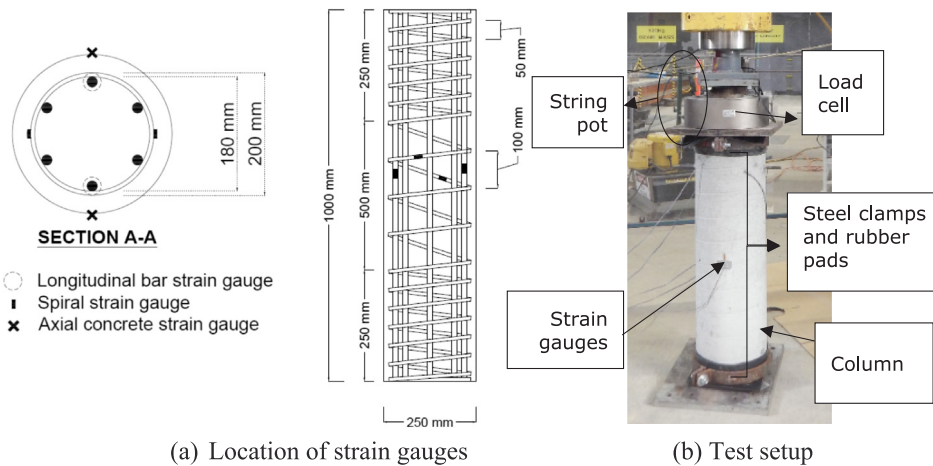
Test setup and instrumentation of the hollow concrete columns.
